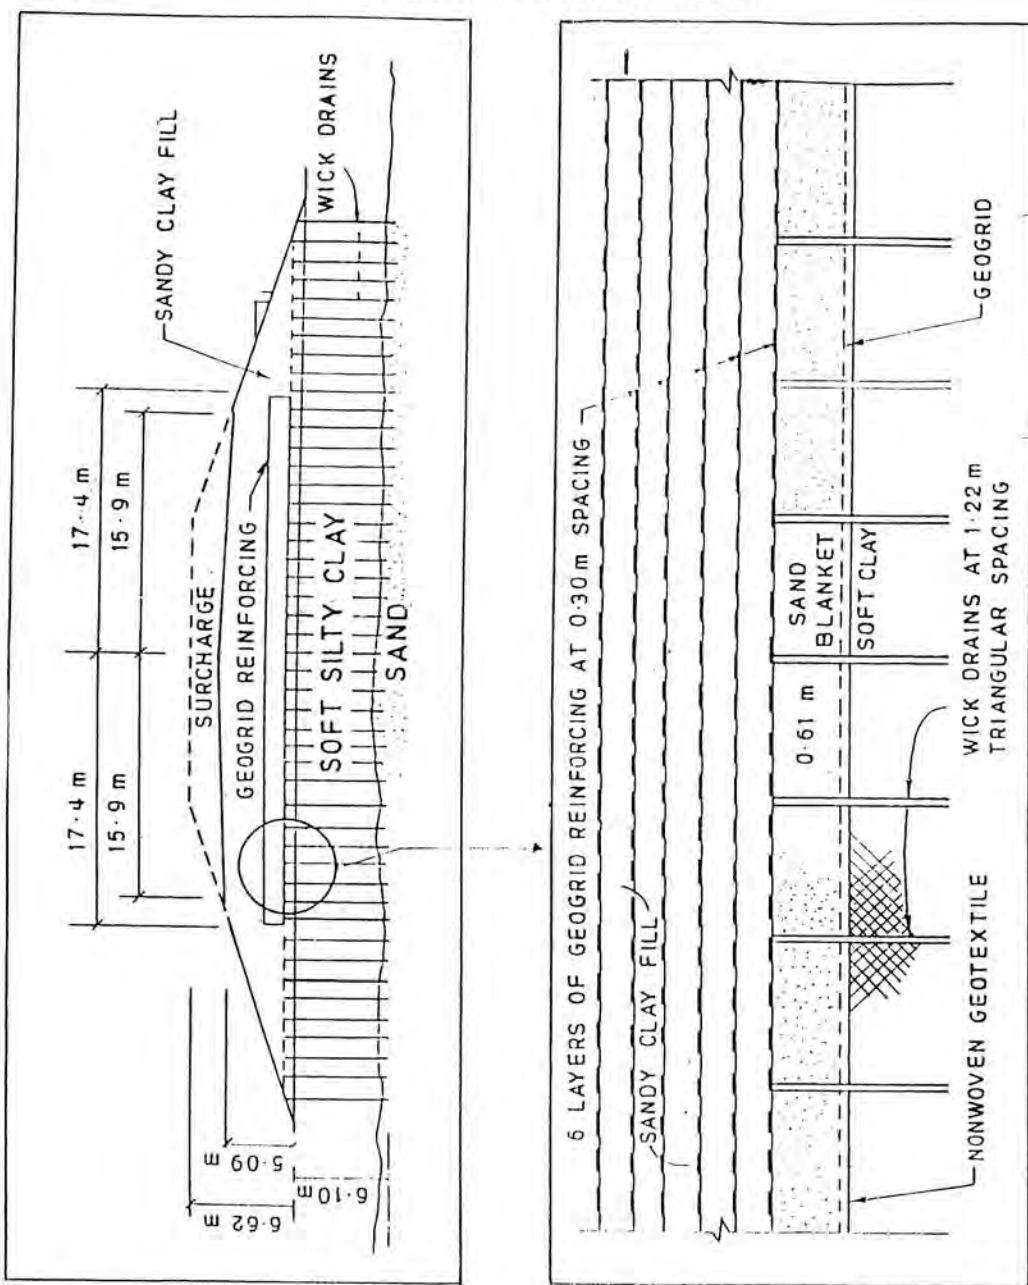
Typical Section of Reinforced Embankment (Lockett et al., 1988)
